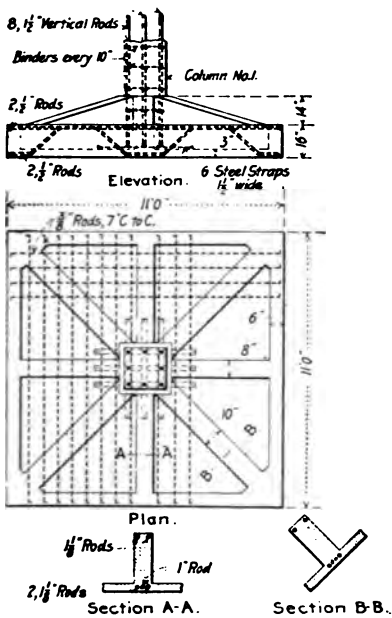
Column Footing for Atlanta, Ga., Terminal Railway Station.
